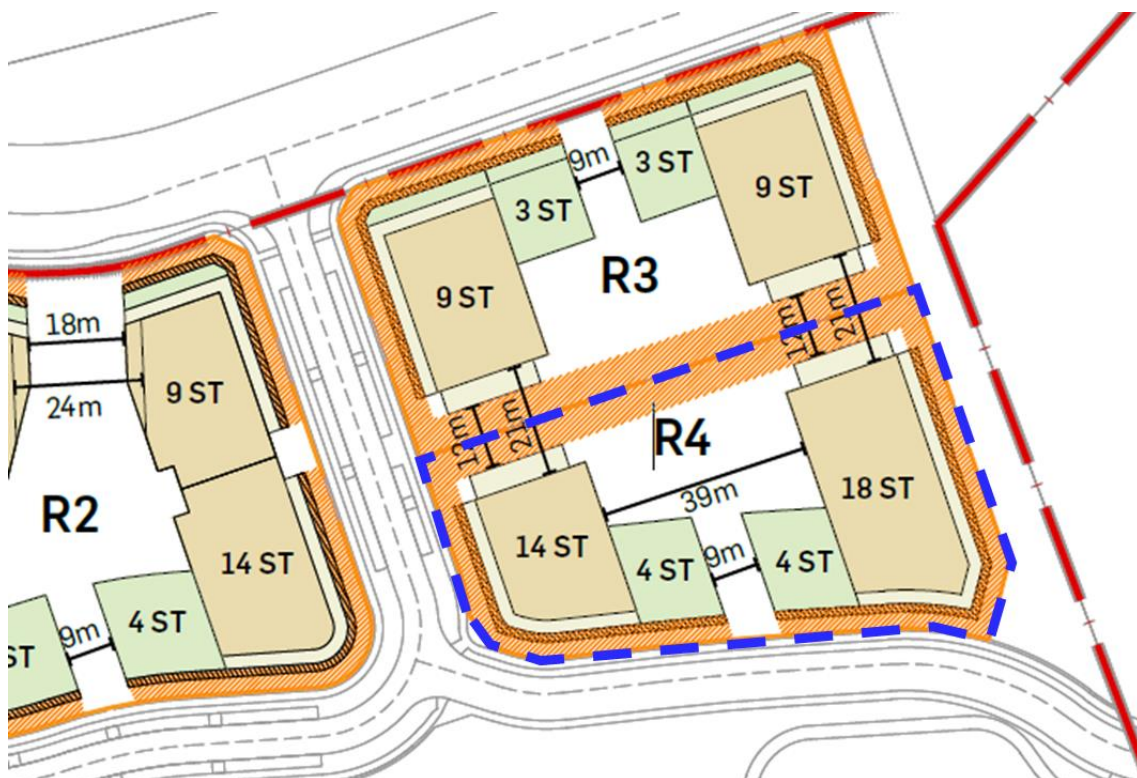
Site R4 future development (Source: Urbis Planning Proposal)
